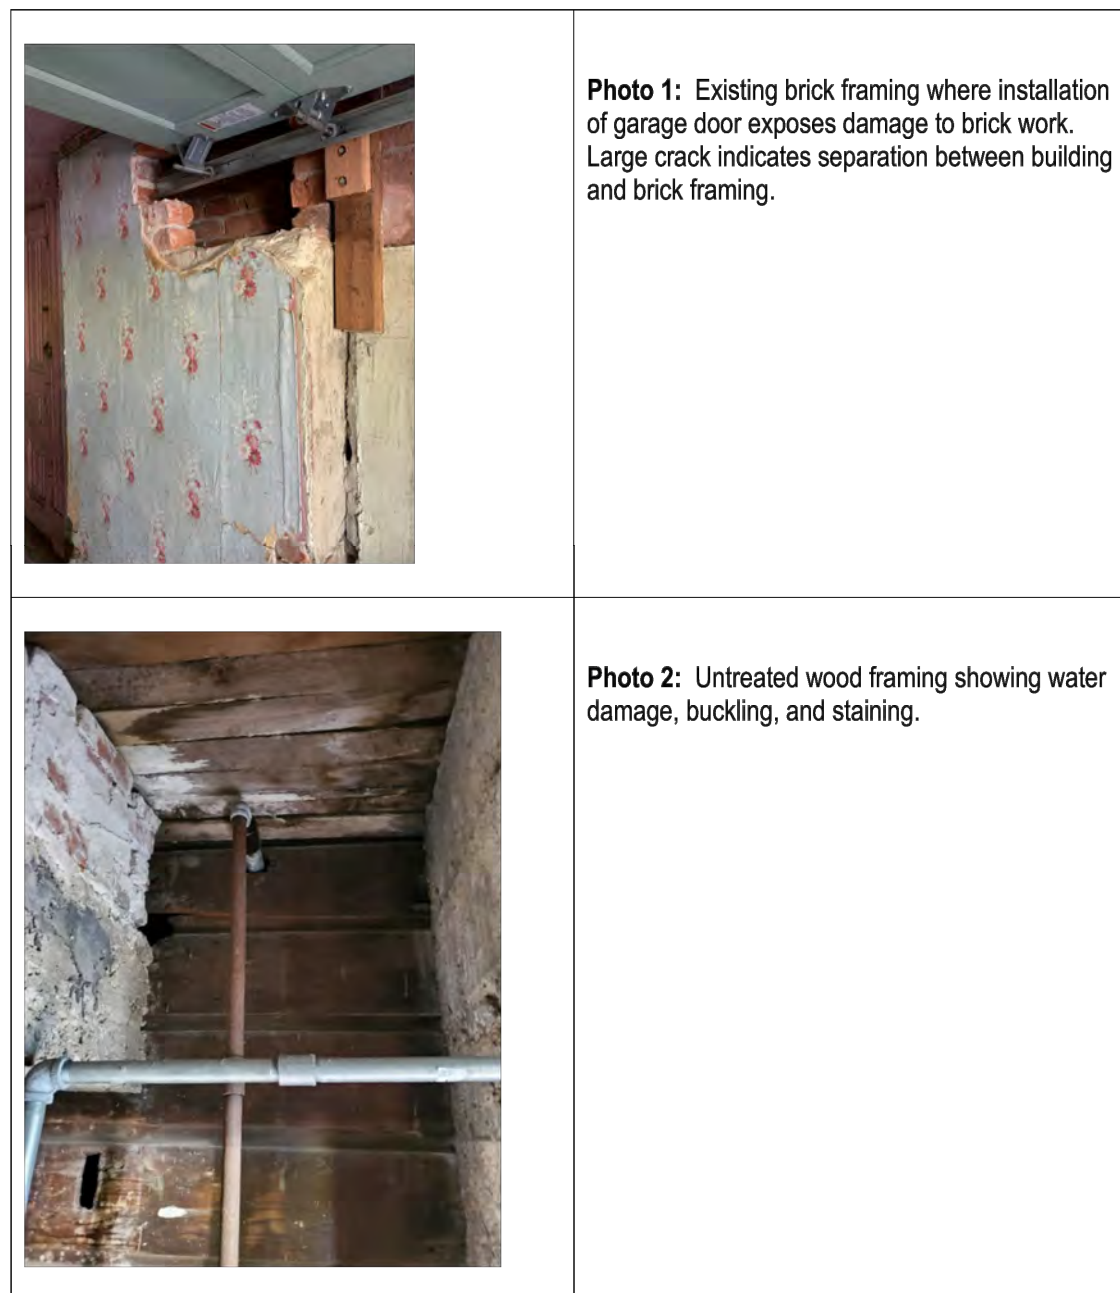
Existing brick framing where installation of garage door exposes damage to brick work. Large crack indicates separation between building and brick framing.
